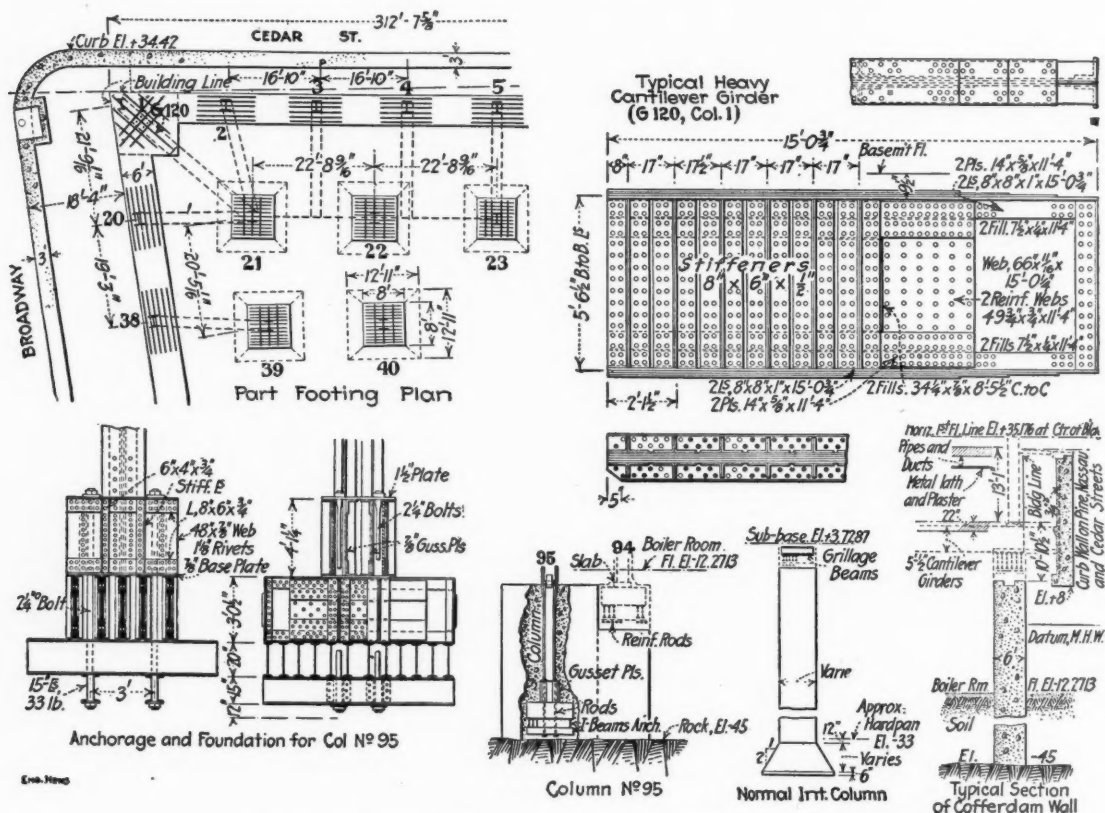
TYPICAL FOOTING SKETCHES, EQUITABLE BUILDING
